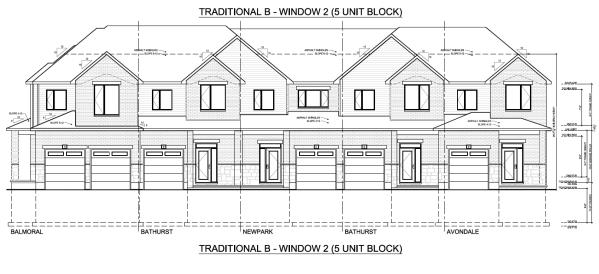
Typical 5 unit townhouse, front and side (street facing) elevations
